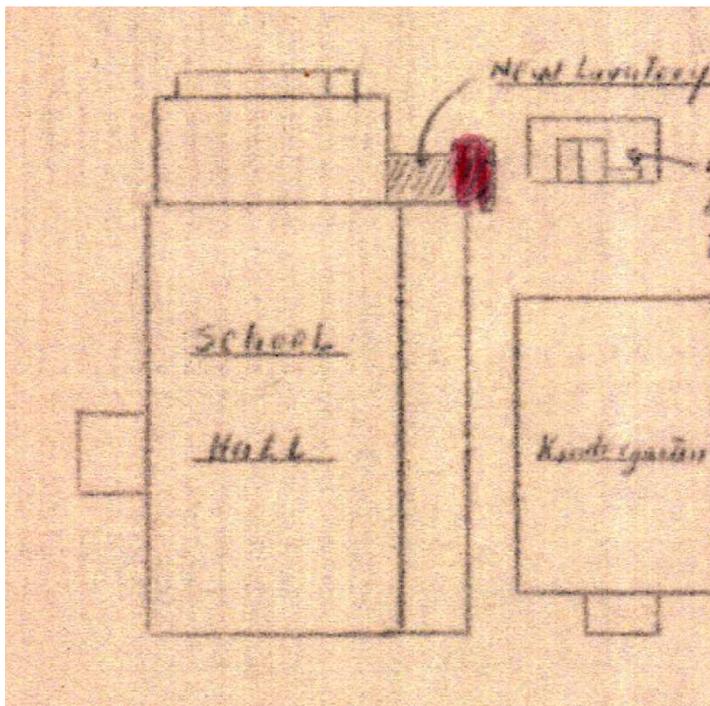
Detail of the site plan, showing the location of the new Lavatory Group at the north-east corner of the Hall. (BP 16897A/1945)
